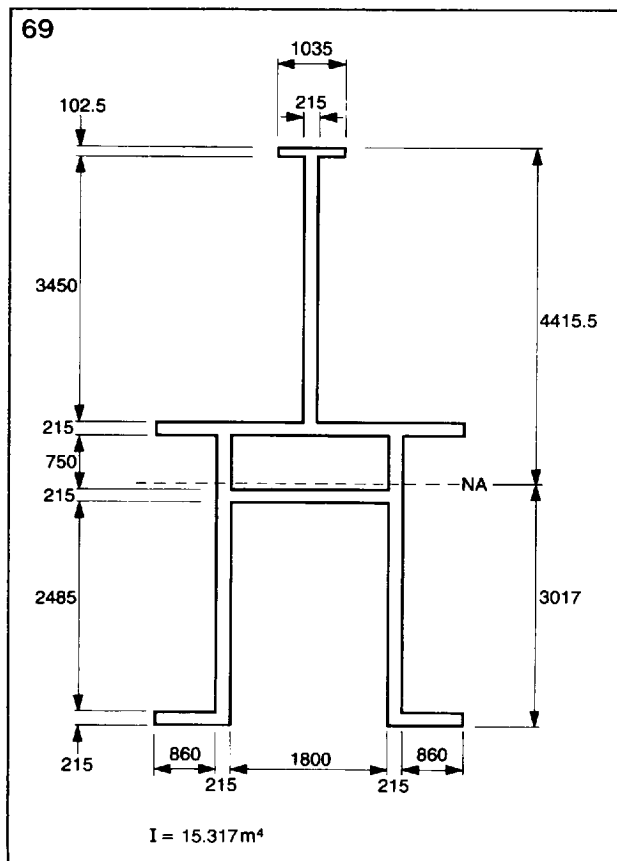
Wall complex made up of walls 2, 5 and 8, see Figure 60 (2 no.)
